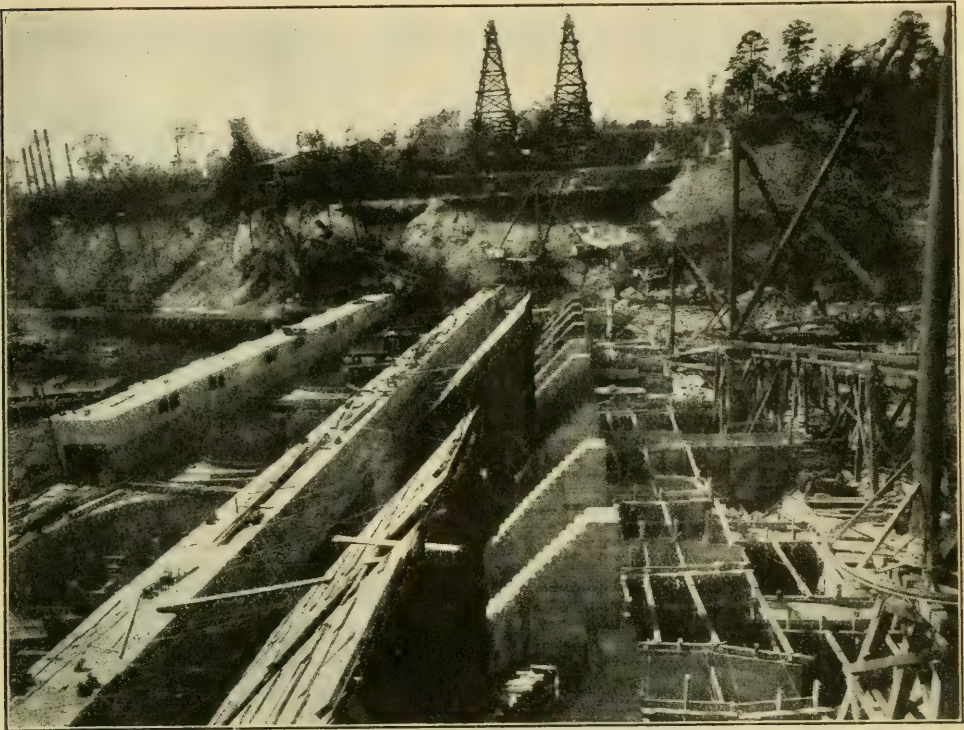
CRADLES FOR PENSTOCK FORMS. SECOND STAGE OF CONSTRUCTION COMPLETED.
